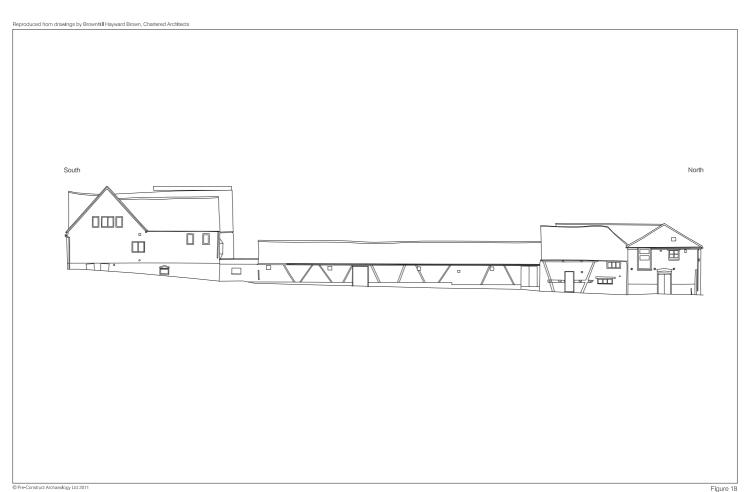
Figure 18 East elevation of buildings across site (Buildings 1, 2, 3 and 5) Musgrove Maltings, Baldock Not to scale at A3
